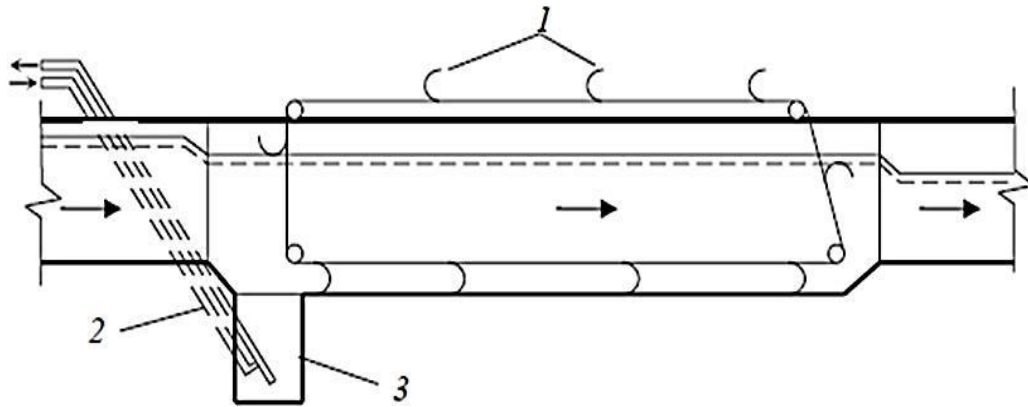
Horizontal sand trap with rectilinear movement of water: 1 – chain scraper mechanism; 2 – hydraulic elevator; 3 – hopper
